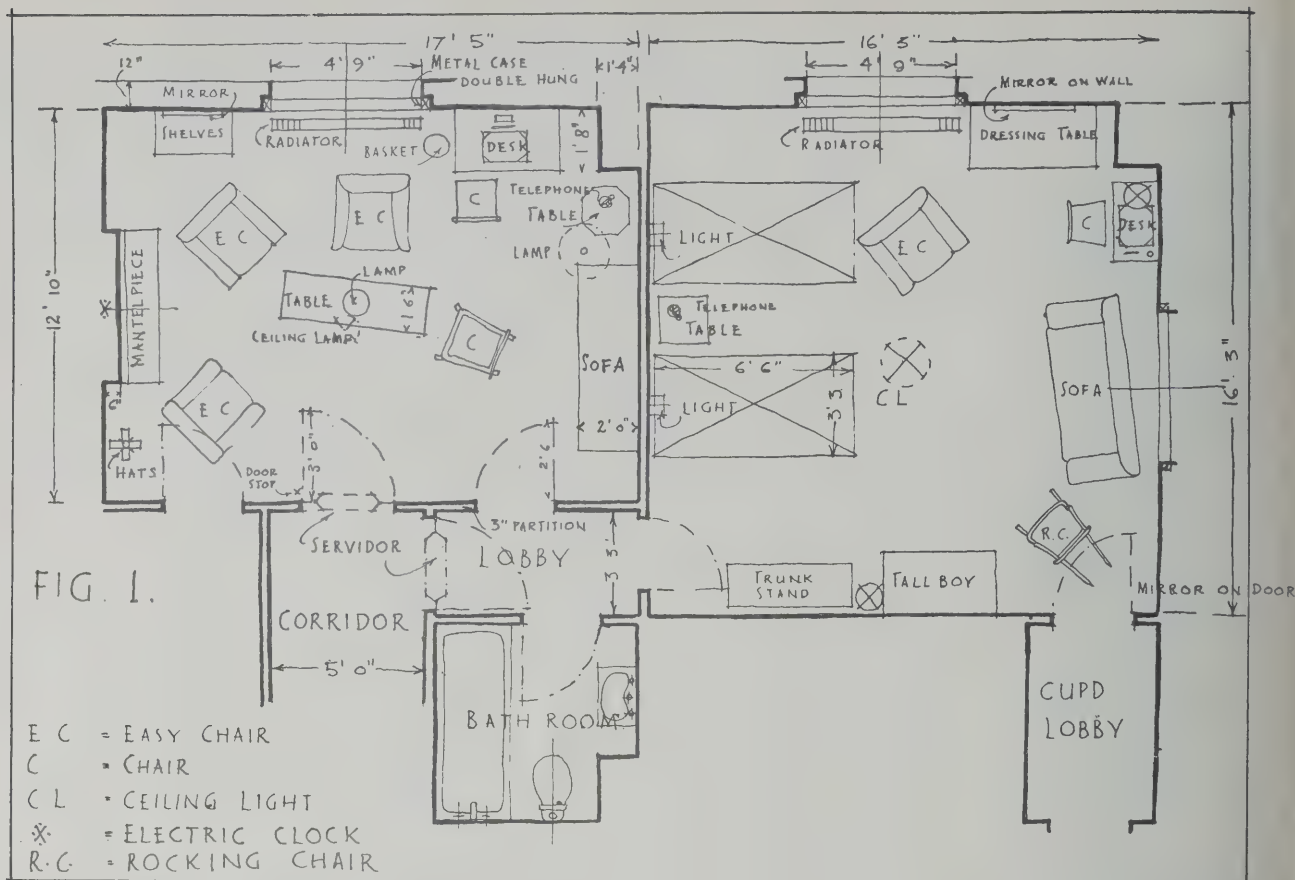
THE PENNSYLVANIA HOTEL, NEW YORK: A TYPICAL LAYOUT OF DOUBLE BEDROOM, SITTING-ROOM, LOBBY AND BATHROOM.
